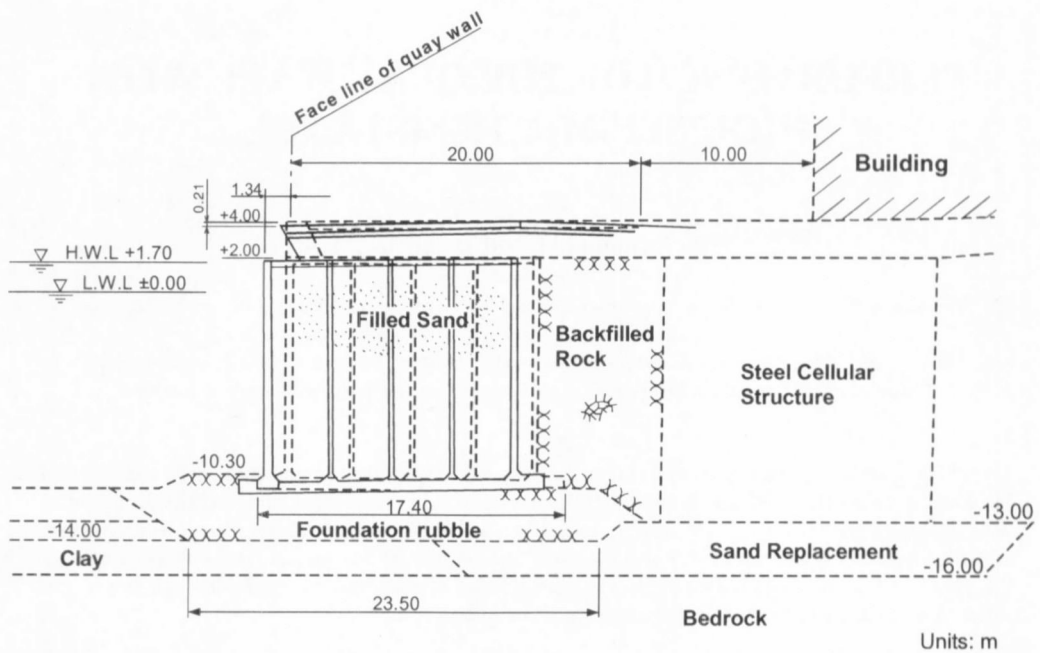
Cross section and deformation of high seismic resistance quay wall.
